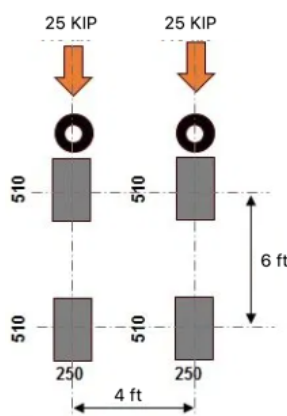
AASHTO design tandem tire plan (adapted from engineeringcivil.org)
